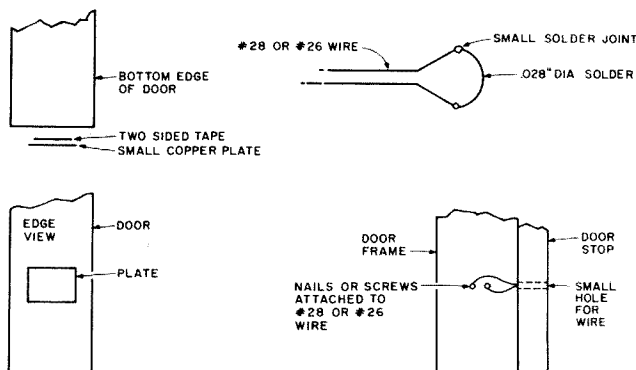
Fire sensor design (upper right) and sensor-mounting tricks.
